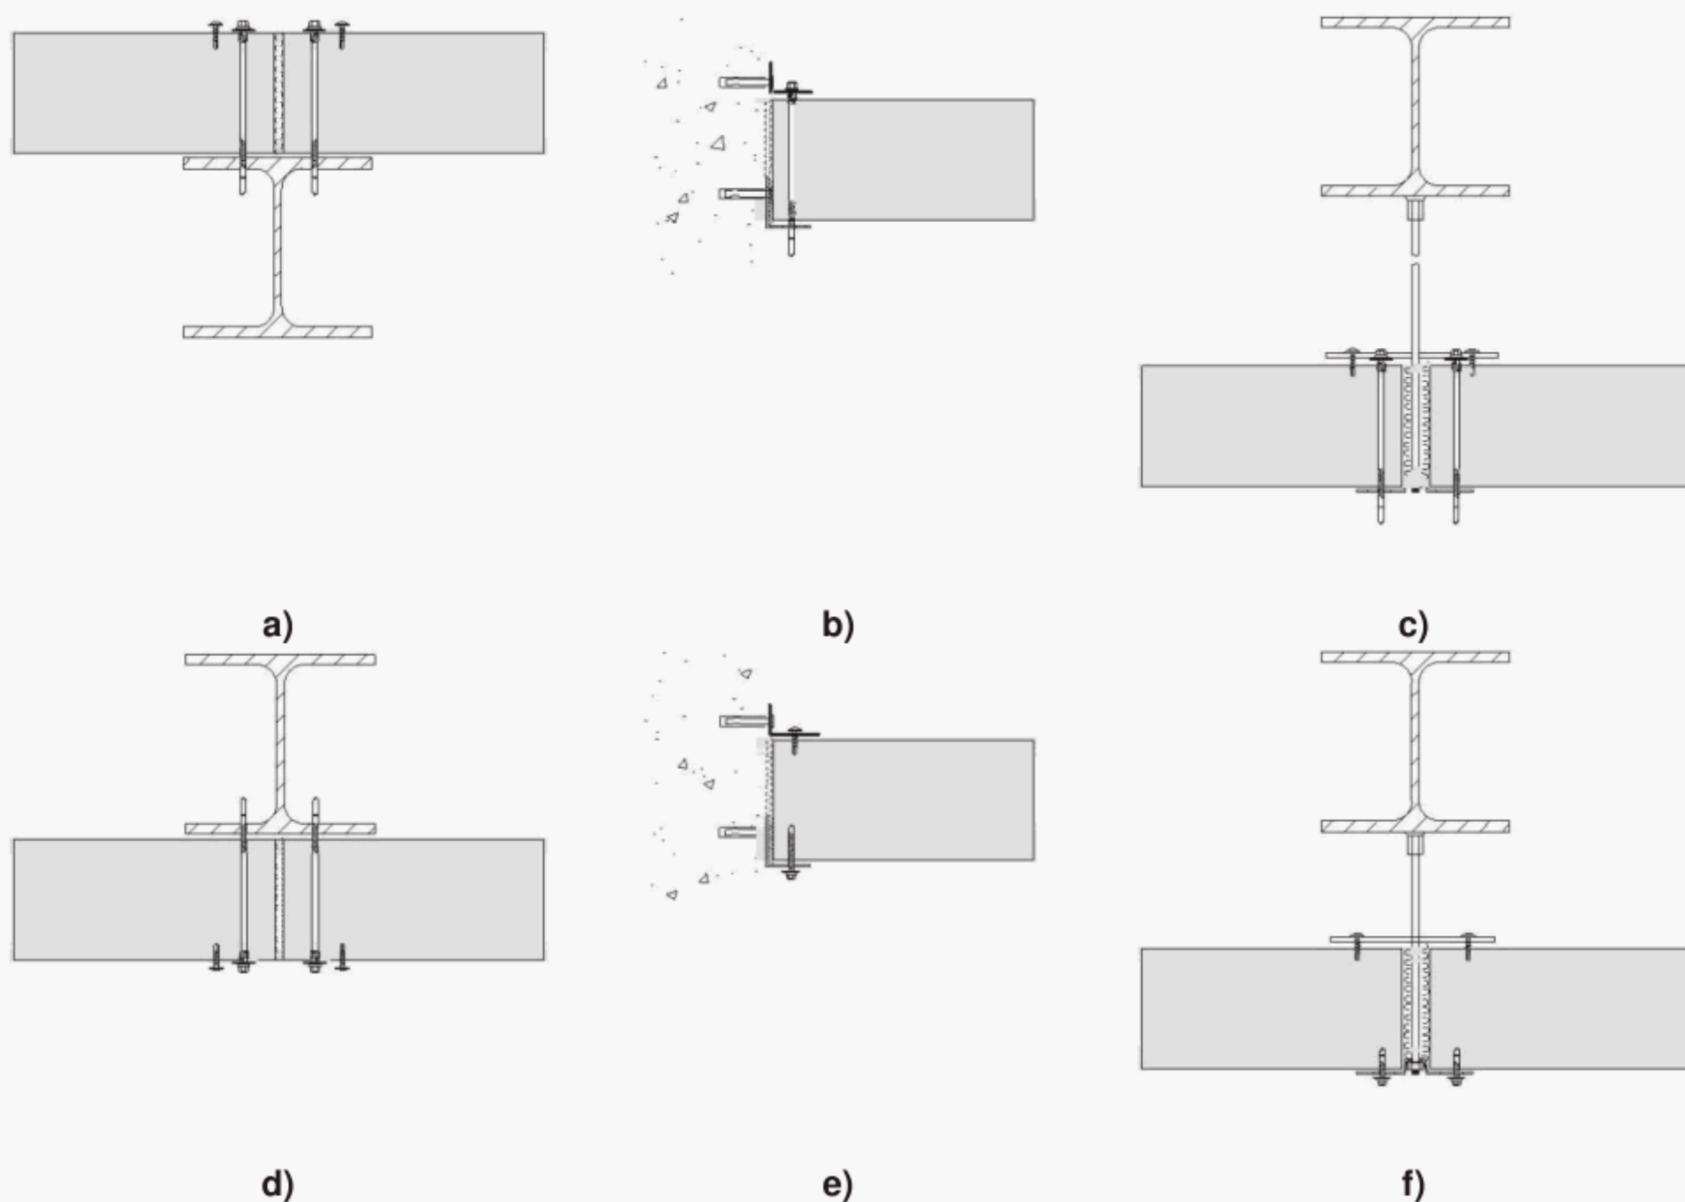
End fixing solutions for sandwich panel ceilings to support structures
